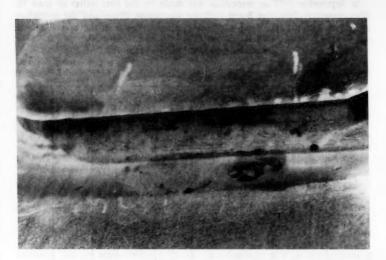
Root Crack in Cover Plate End Weld
